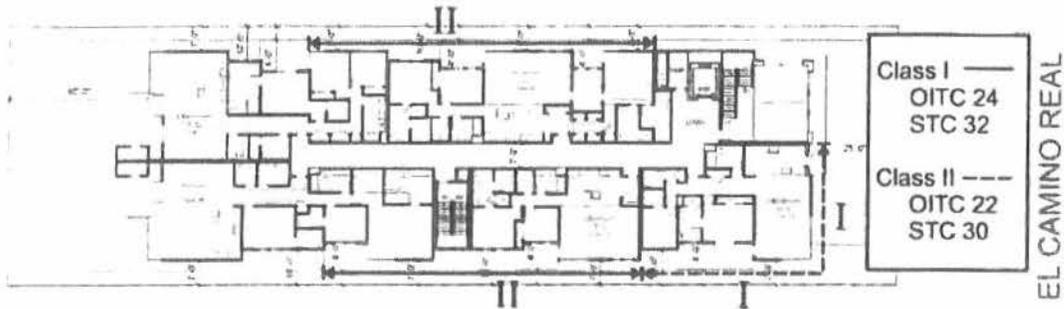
B: *Minimum recommended glazing ratings for Floor 2
